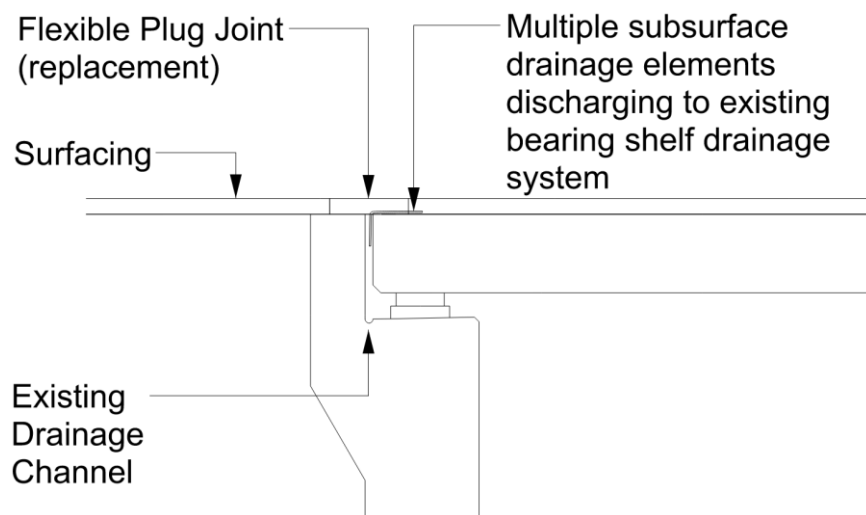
Section illustration for sub-surface drainage into the abutment bearing shelf
